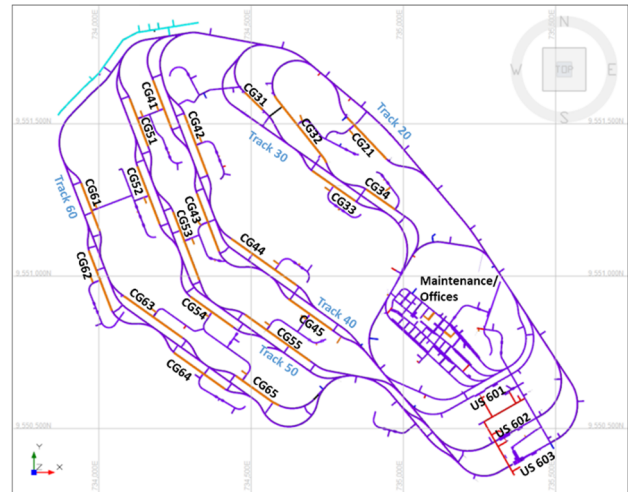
Rail Haulage Layout showing the main line, chute galleries, unloading stations and maintenance facilities.
